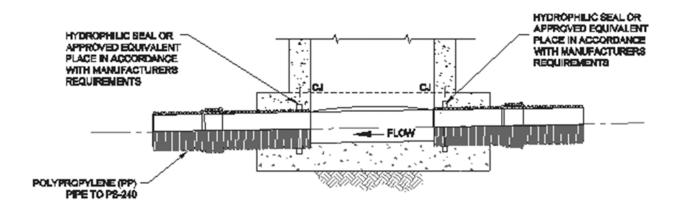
TYPICAL CAST IN-SITU CONCRETE MH BASE FOR PROFILE WALL PP SEWERS
